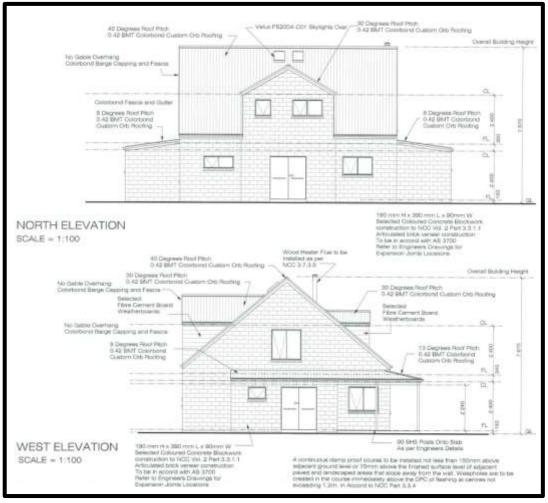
north and west elevations of proposed dwelling (Nicholas Fitsialos, 2017)
